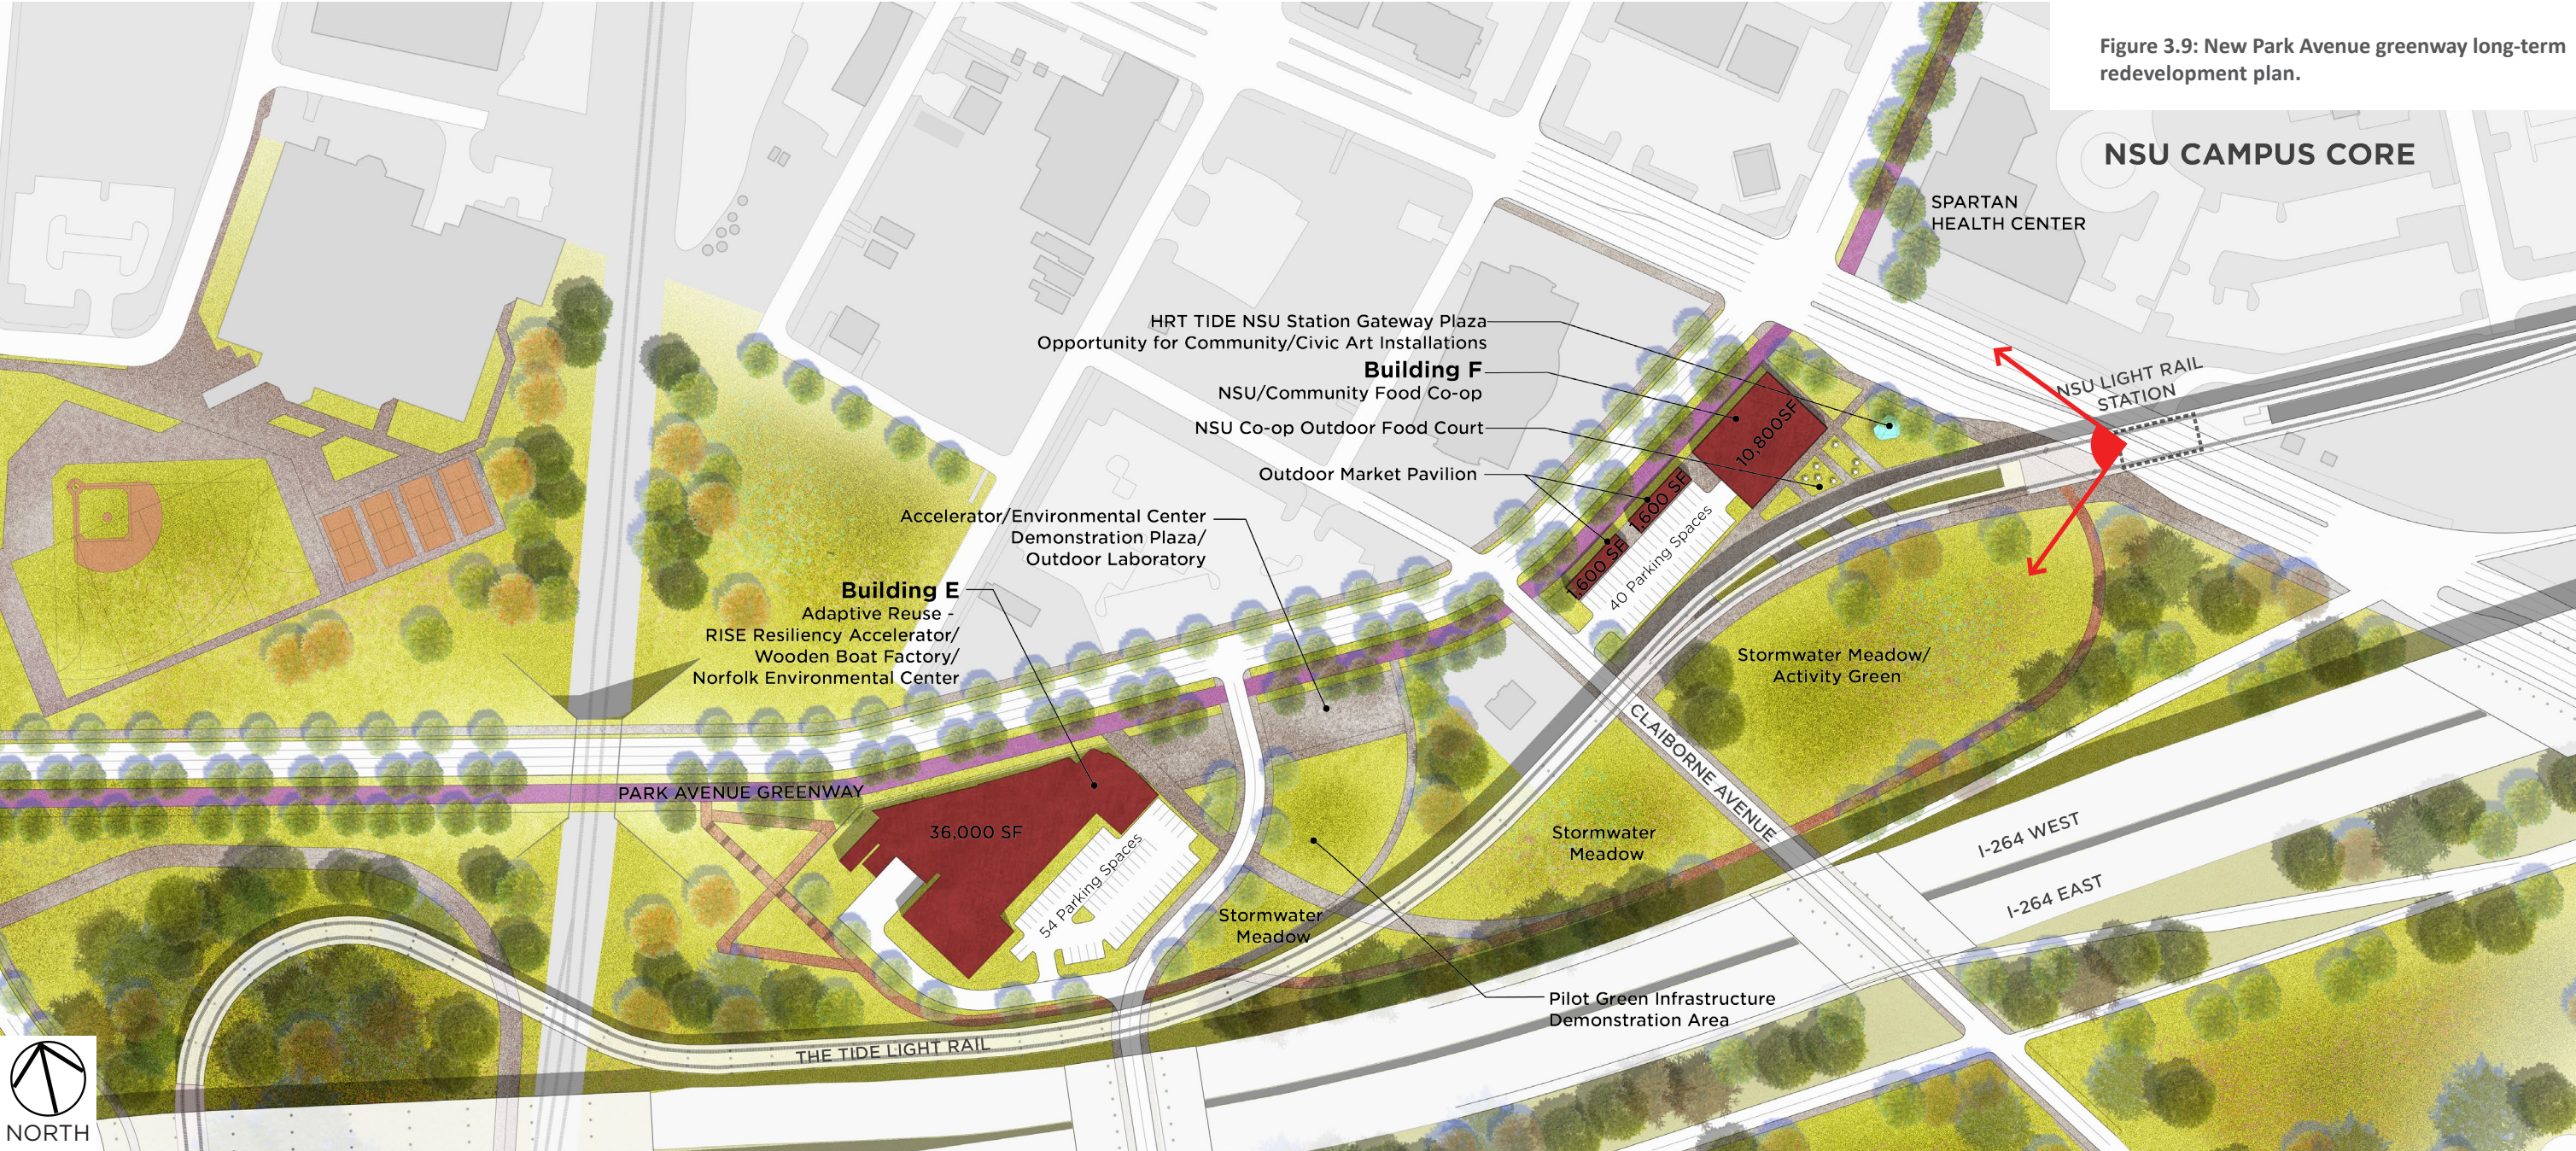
New Park Avenue greenway long-term redevelopment plan.
